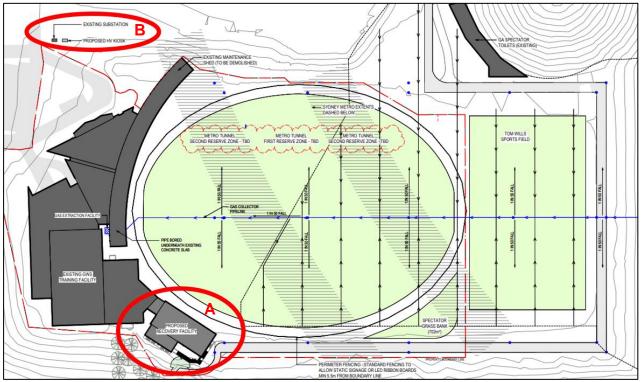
Site plan illustrating the location of the proposed pool facility (A) and proposed kiosk substation (B) circled in red (*Source: Proposed Site Plan, prepared by Populous, 15 December 2023*)
